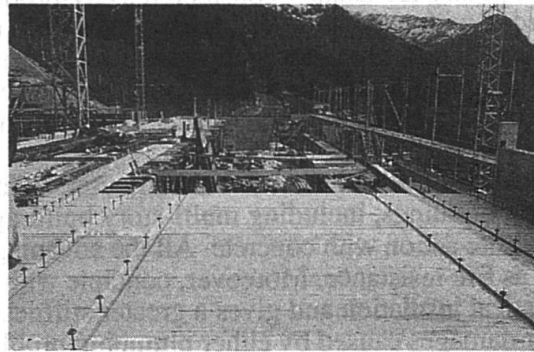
Wood elements and dowels for a timber-concrete composite slab: School in Triesenberg (FL).
